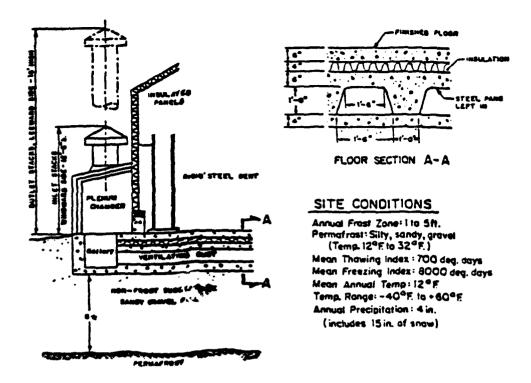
Pan-slab foundation showing plenum chamber and ventilation duct (after Sanger, Ref. 7).
